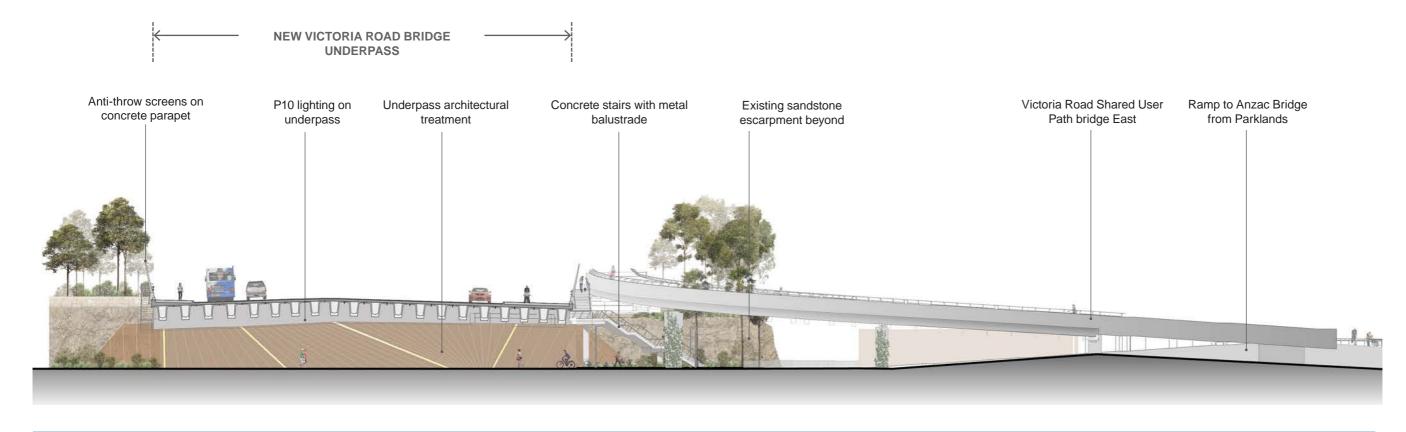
New Victoria Road Bridge, stairs to Victoria Road and Victoria Road Shared User Path Bridge (east) - Elevation
